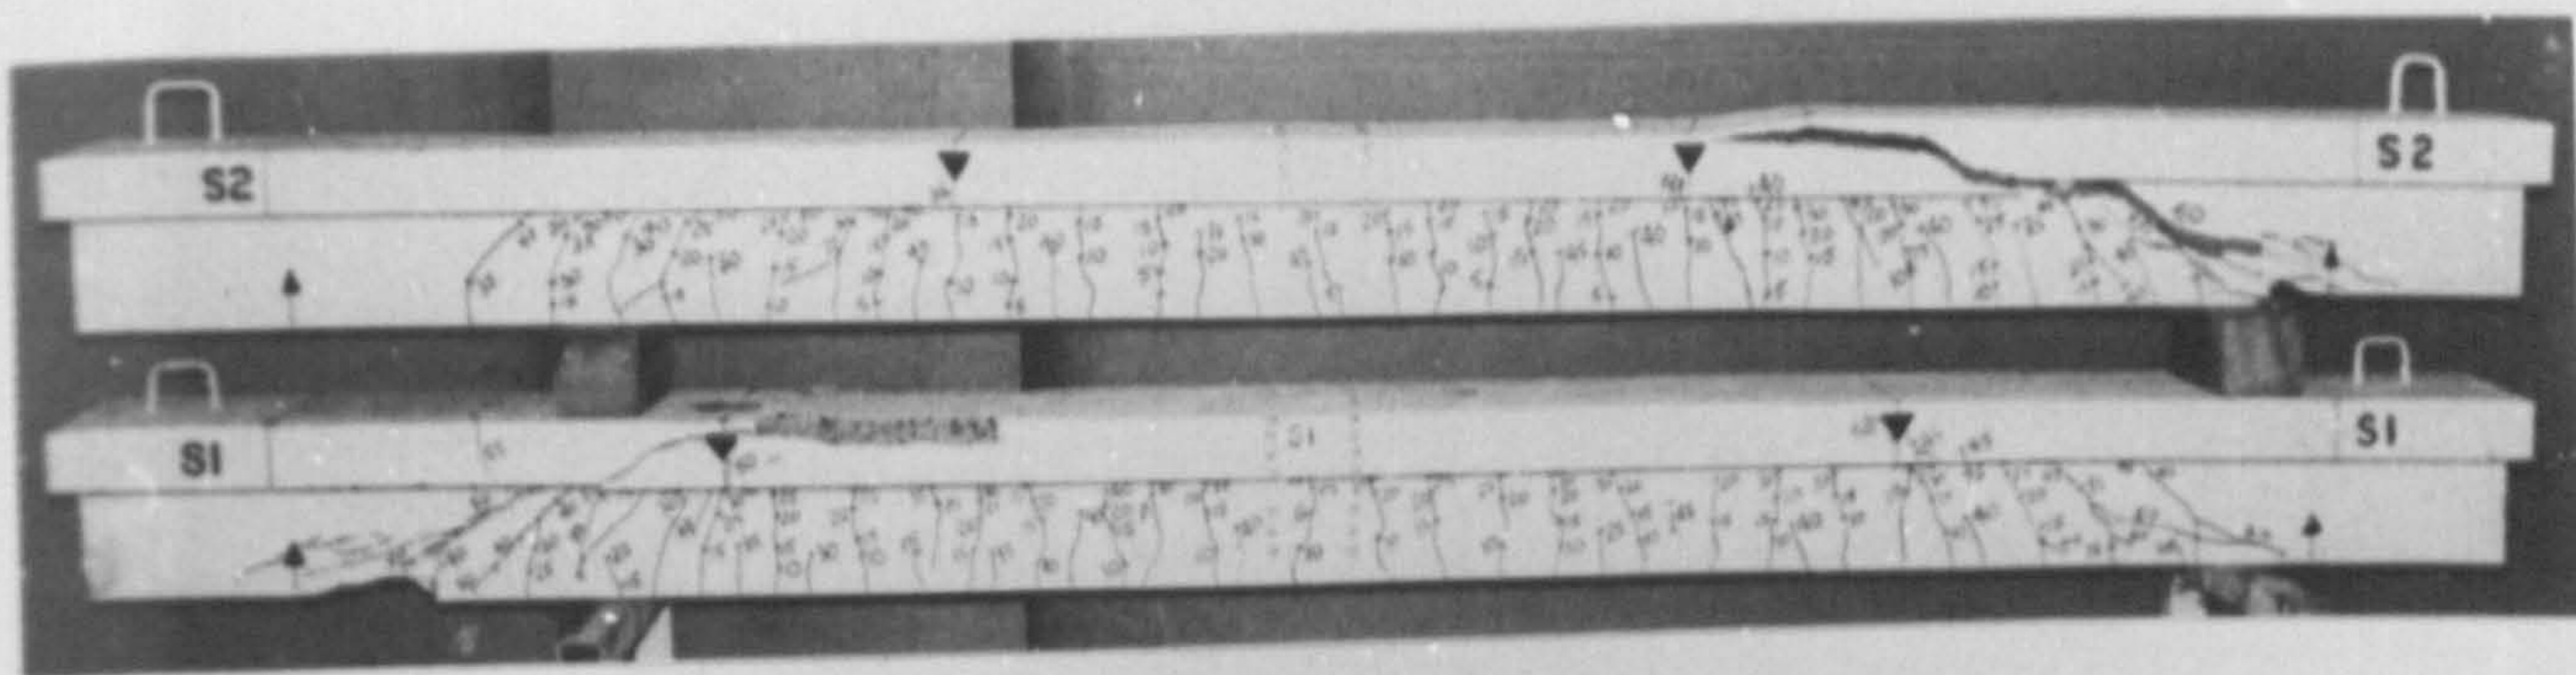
(c) FAILURE MODES FOR LYTAG-SAND CONCRETE T-BEAMS IN SHEAR
